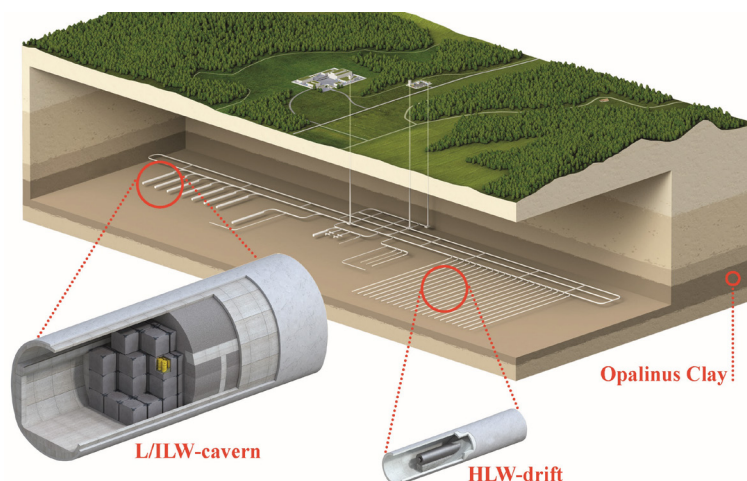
Schematic layout of a combined L/ILW- and HLW-repository.
